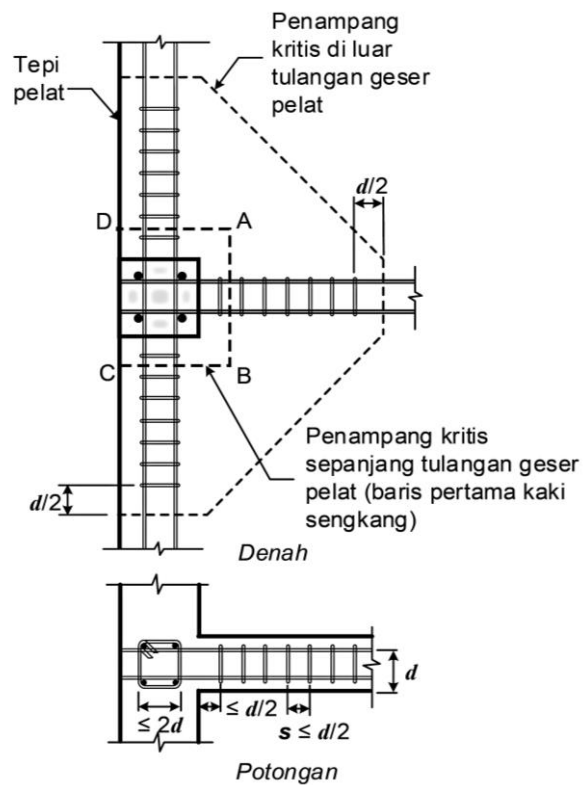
Setting of Edge Column Shear Stirrups Reinforcement (SNI 2847:2019)
